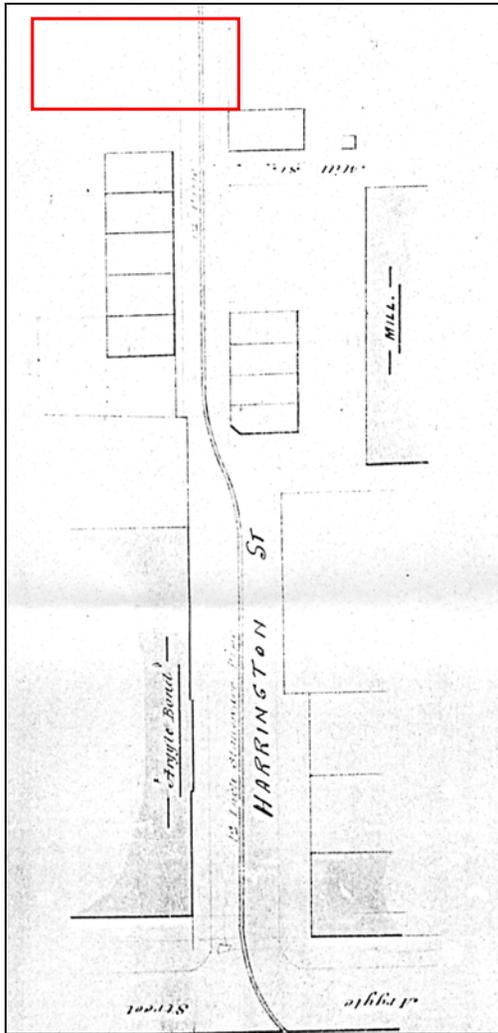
1875 sewer plan indicating the presence of five buildings south of the subject site.
